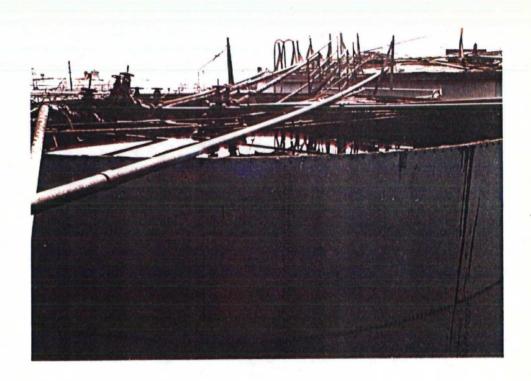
Tank D-14, Aqueous Level One Foot From Hole in Sidewall. 4/8/85
